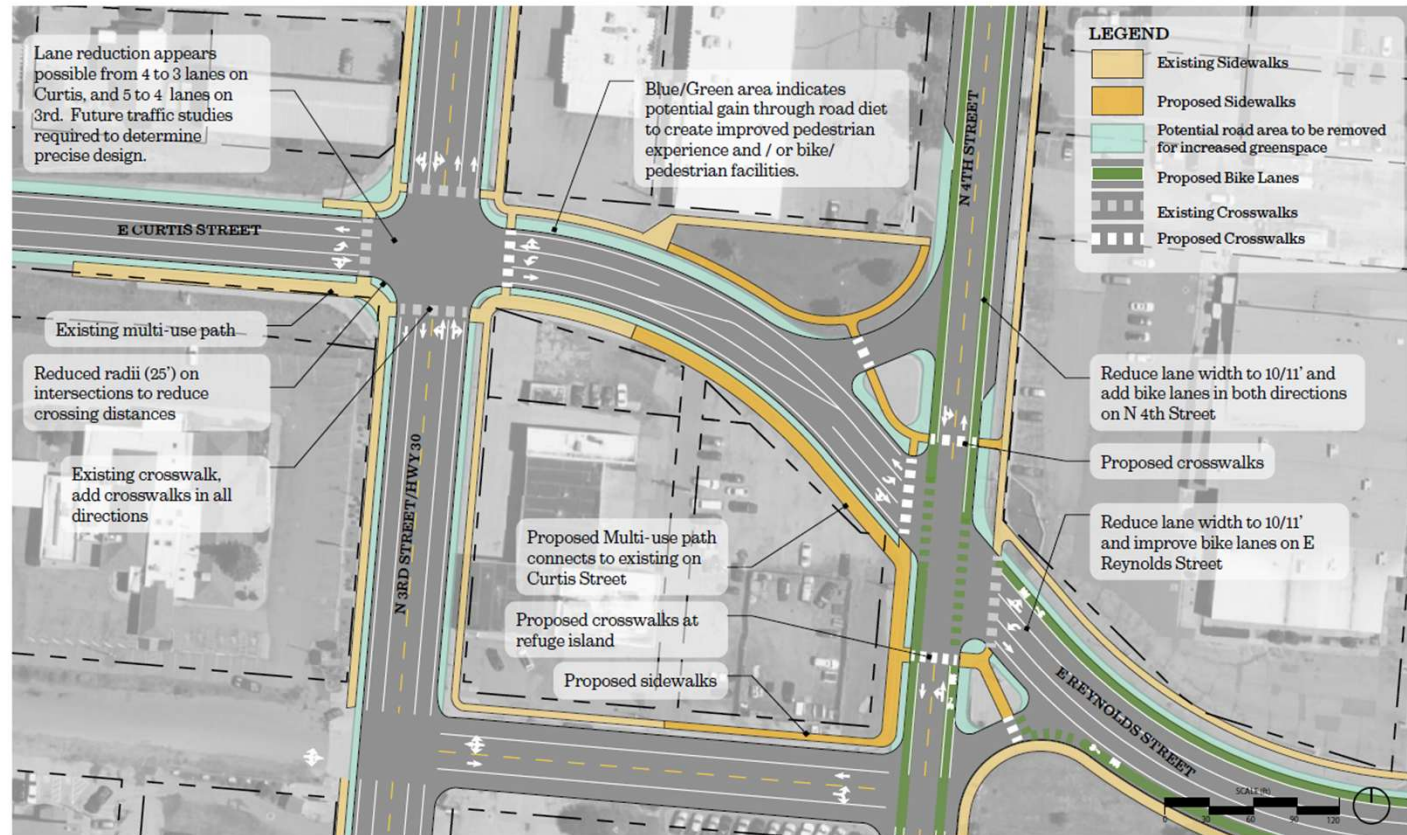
CUR-5 Concept Design Preliminary Concepts | Curtis/Reynolds Street at 3rd and 4th
